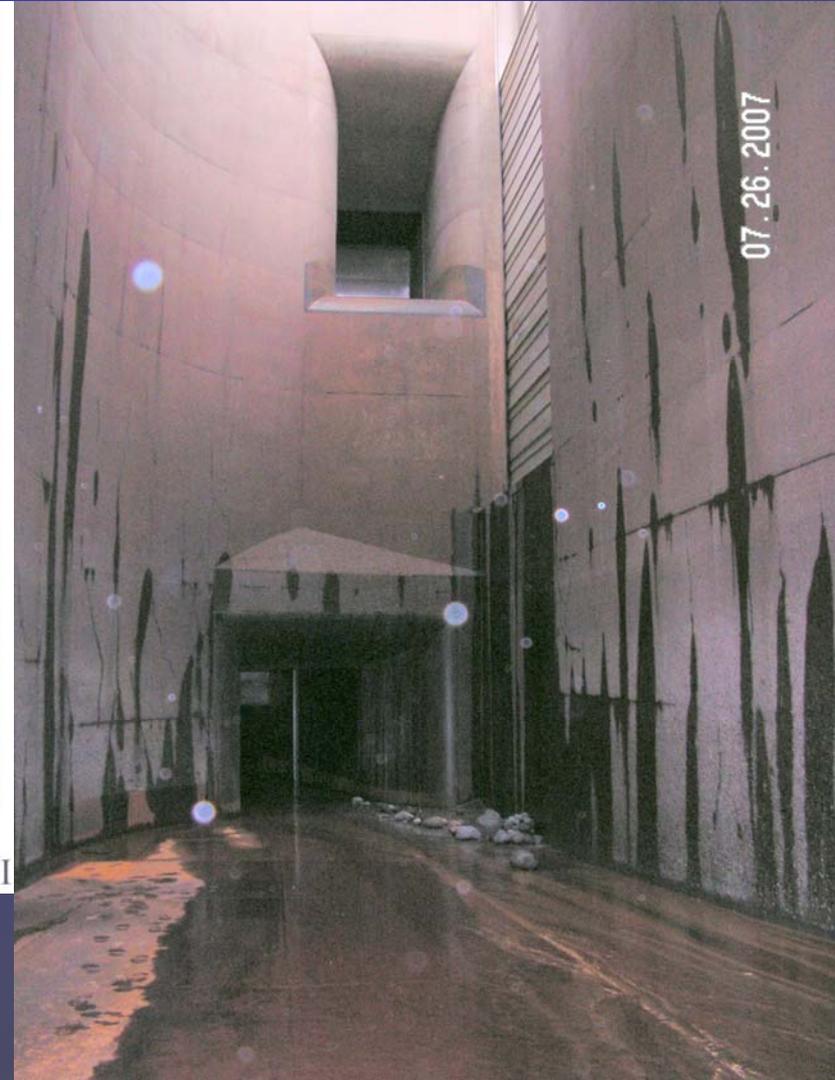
Typical 9-Foot Tunnel Bedload, ~ 4 feet deep during the PI
